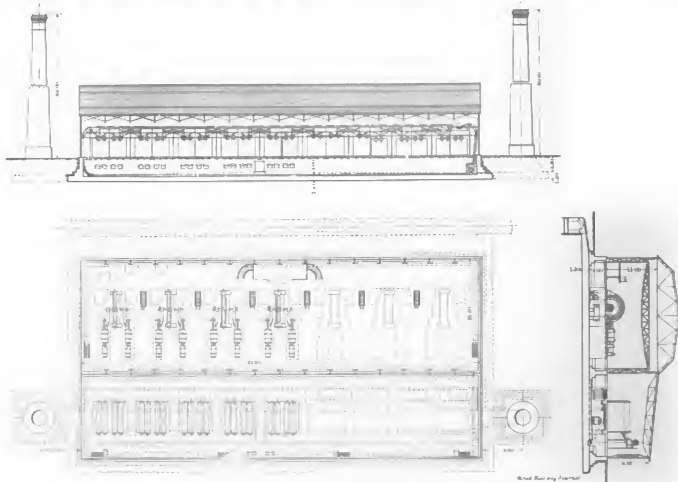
PLAN AND SECTION OF NEW POWER STATION, BRUSSELS
